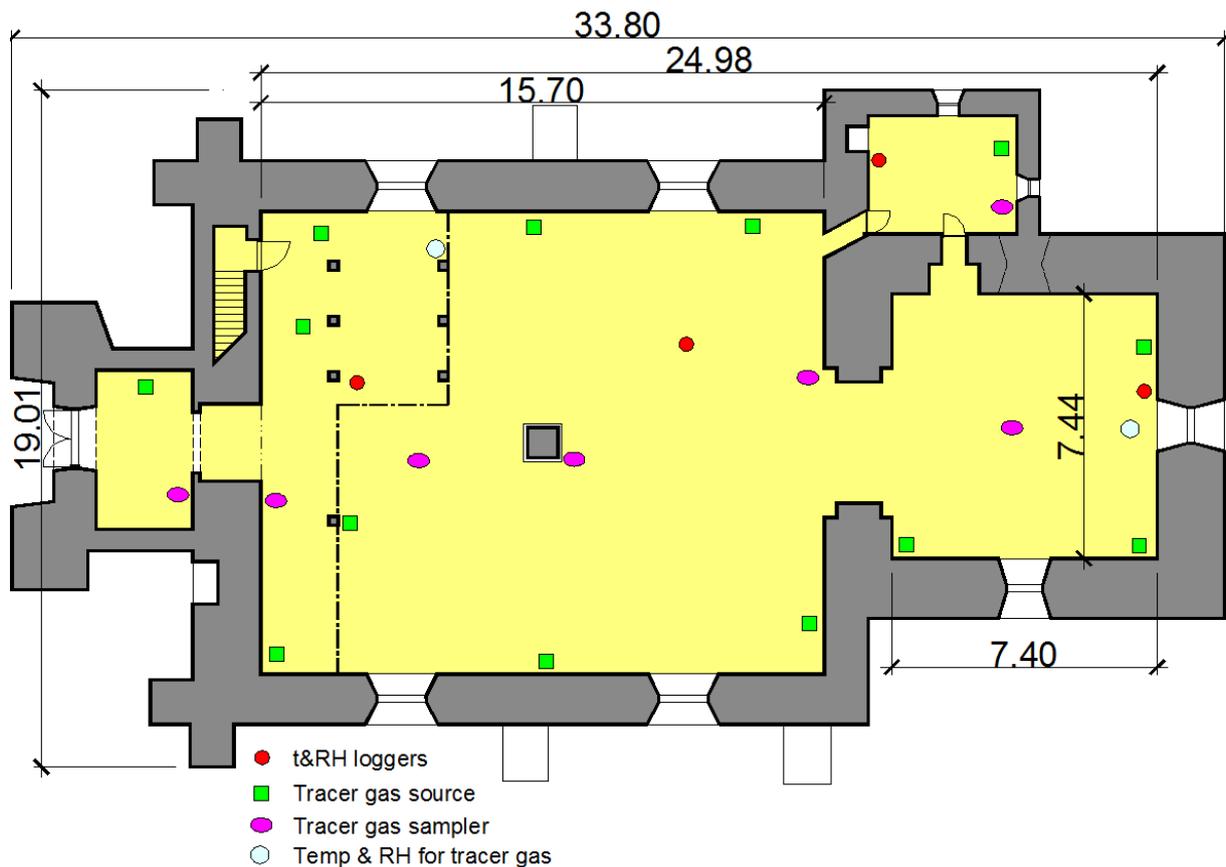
Church plan M 1:200, with loggers and tracer gas locations
